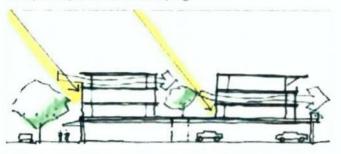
Comfortable separation space allows for sunlight access to individual units and outdoor spaces.
